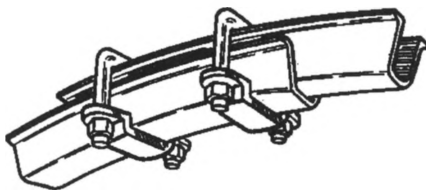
Assembly of a sliding joint in a Toussaint-Heintzmann or Top Hat section steel rib.
